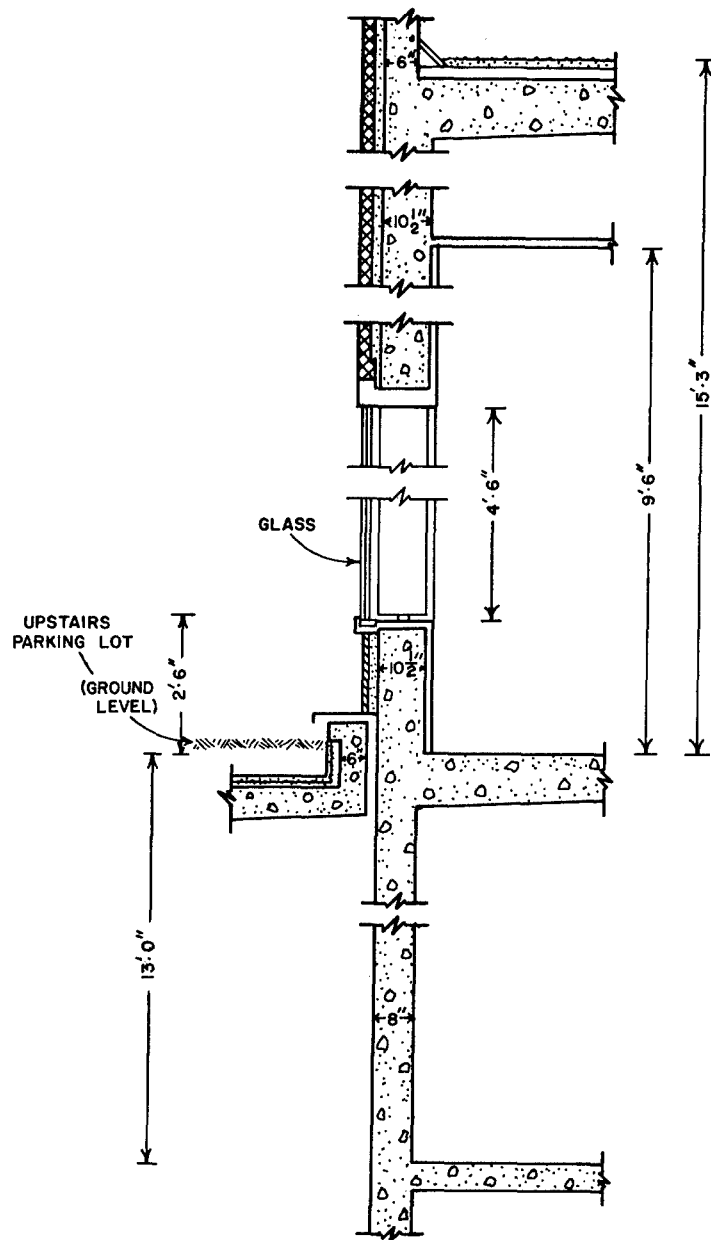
Typical south-wall section of Los Angeles Police Department building.
